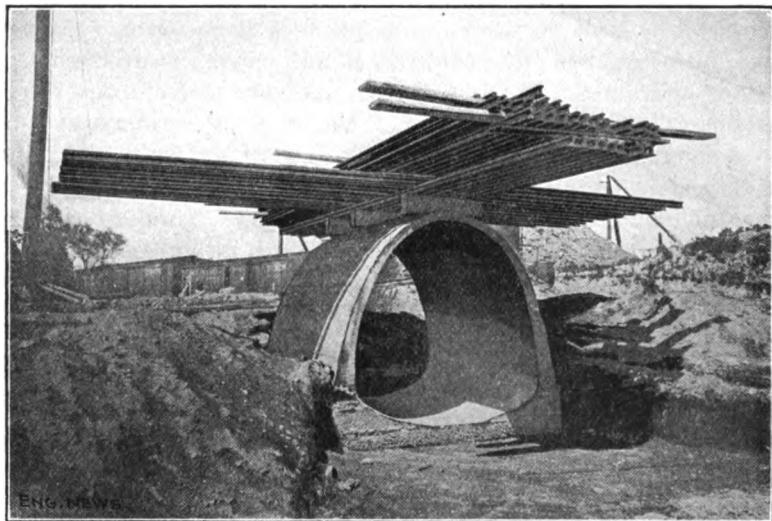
Section of Water Conduit, Boonton, N. J., Showing Weight Carried During Test.
